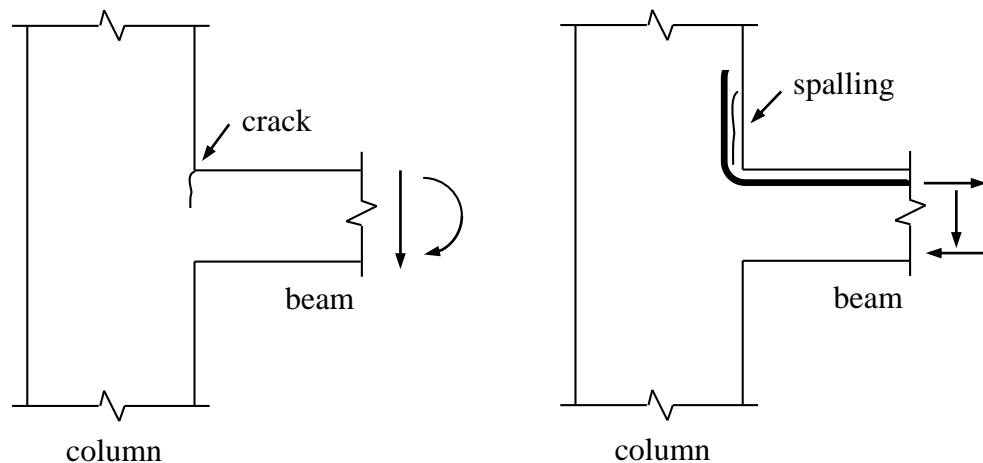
Cracking and spalling at beam-column interface
